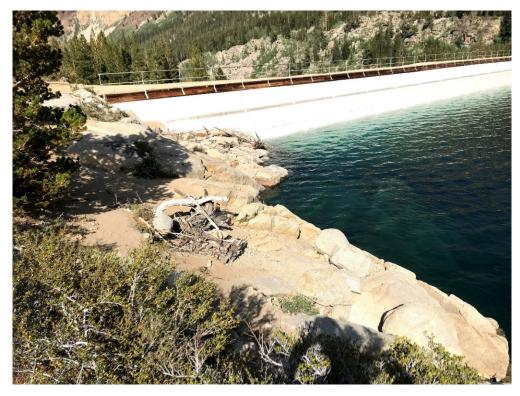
Fishing Access on Upstream, Western Side of Hillside Dam
